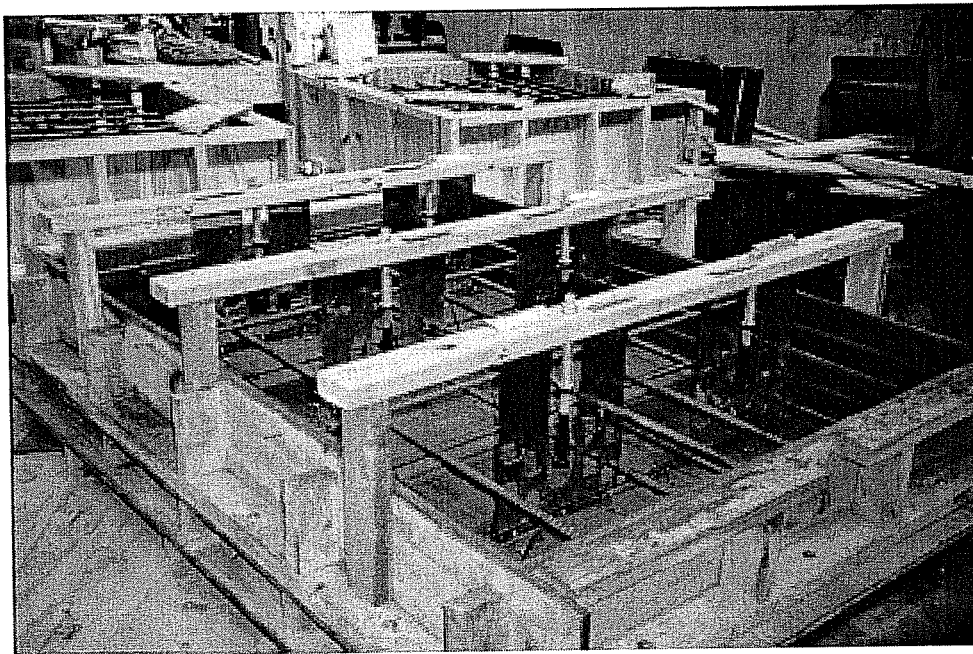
Form Prior to Casting Tension Tests of Cast-in-Place Anchors in Cracked Concrete
